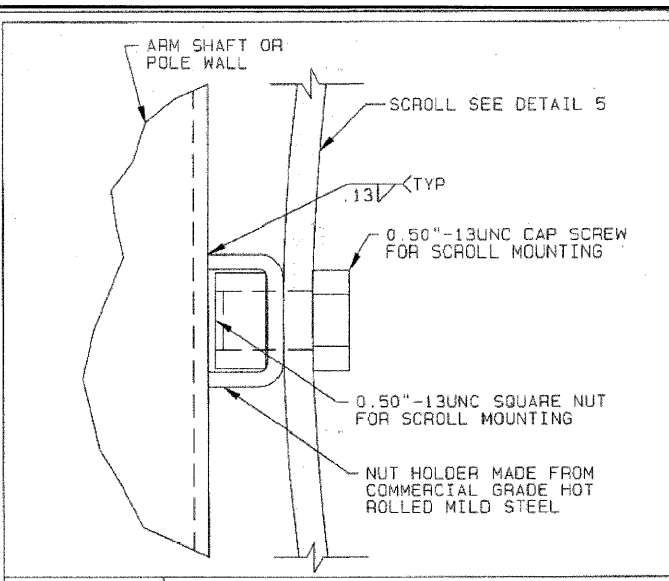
LUMINAIRE ARM ATTACHMENT
